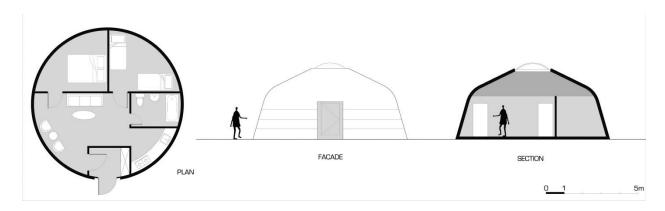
Drawing of the developed yurt with plan, façade, and section. (Family yurt-2).
